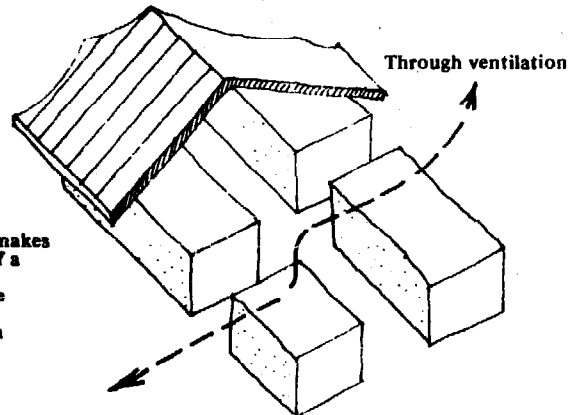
Where the need for rooms makes it necessary to build on both sides of a central corridor the building will be poorly ventilated. Ventilation will be improved by leaving an unenclosed space here and there, to give through ventilation.
